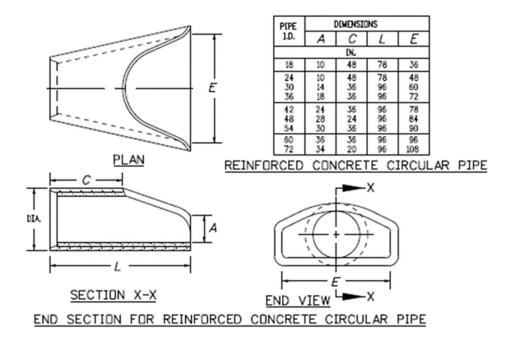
Example End Section for Reinforced Concrete Circular Pipe from CDOT Standard Plan No. M-603-10
